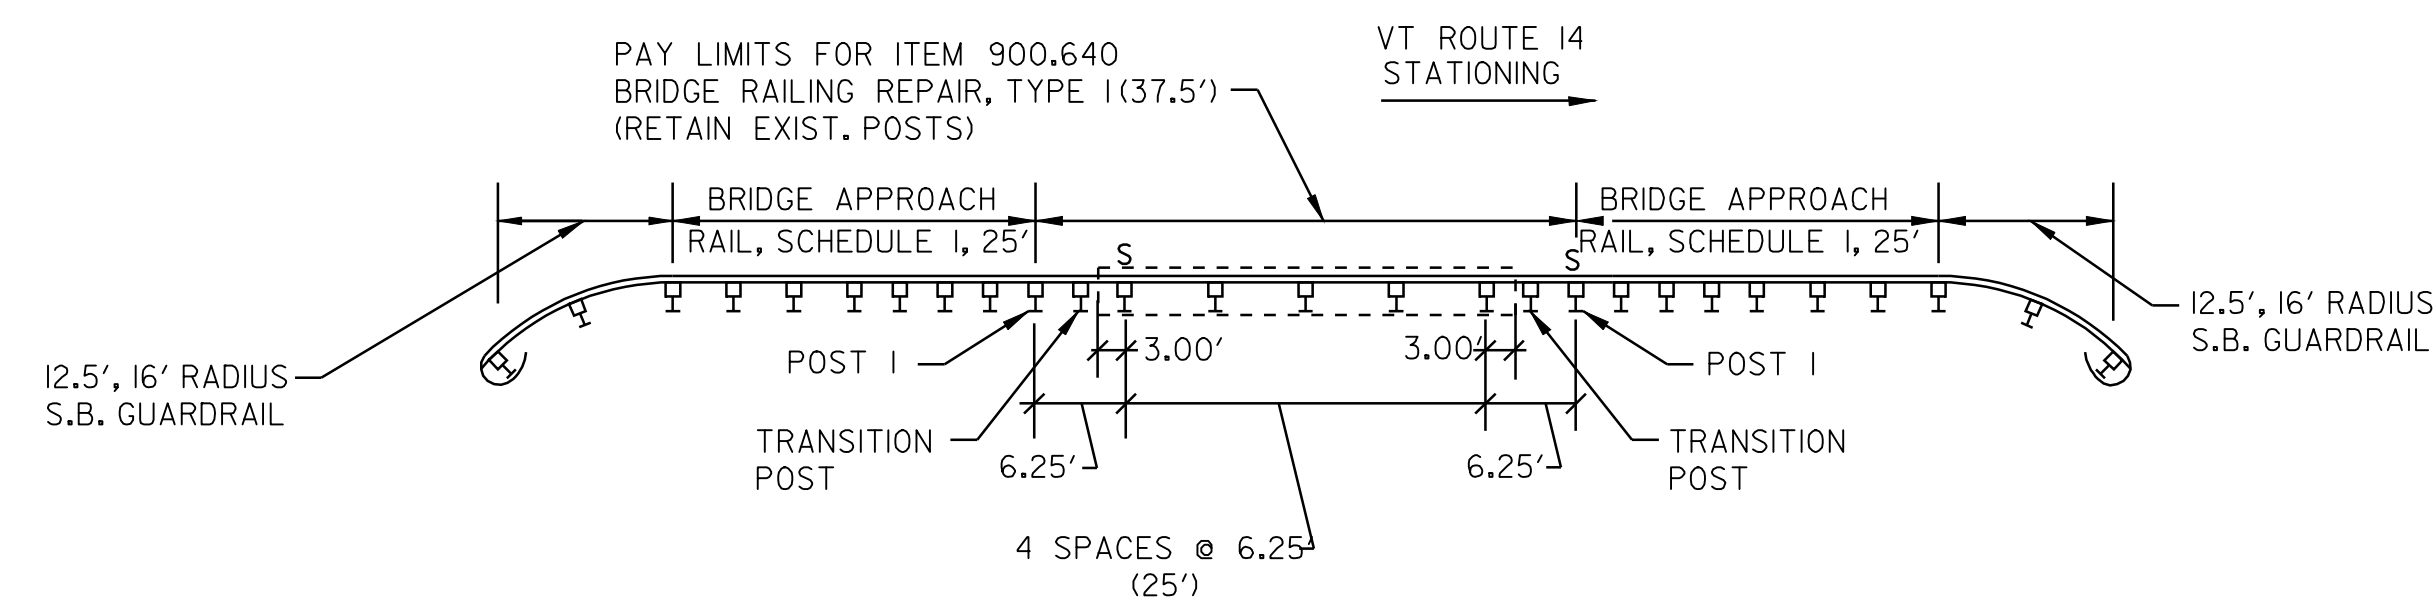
DETAIL OF STEEL BEAM GUARD RAIL AT SMALL CULVERTS
